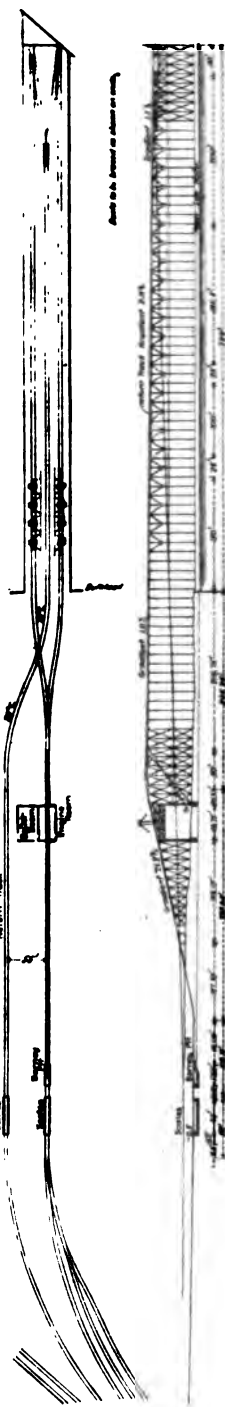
Plan and elevation, coal pier, Port Covington, Md.—Western Maryland.
